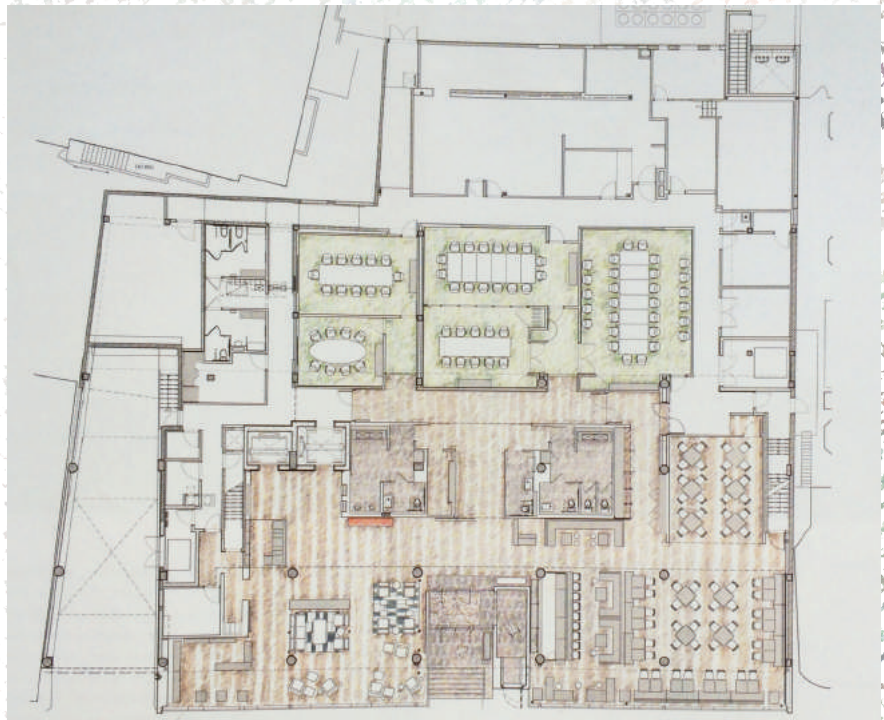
Lobby Floor Plan, Study at Yale, New Heaven, United Kingdom, 2013
